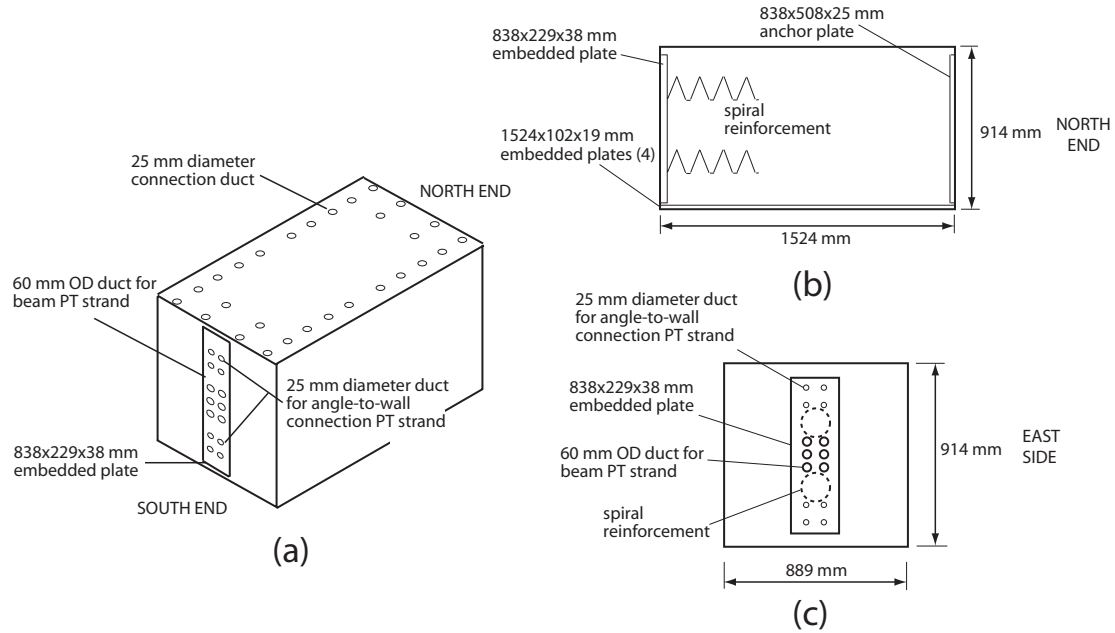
Loading block: (a) 3D view; (b) side view; (c) south end view
